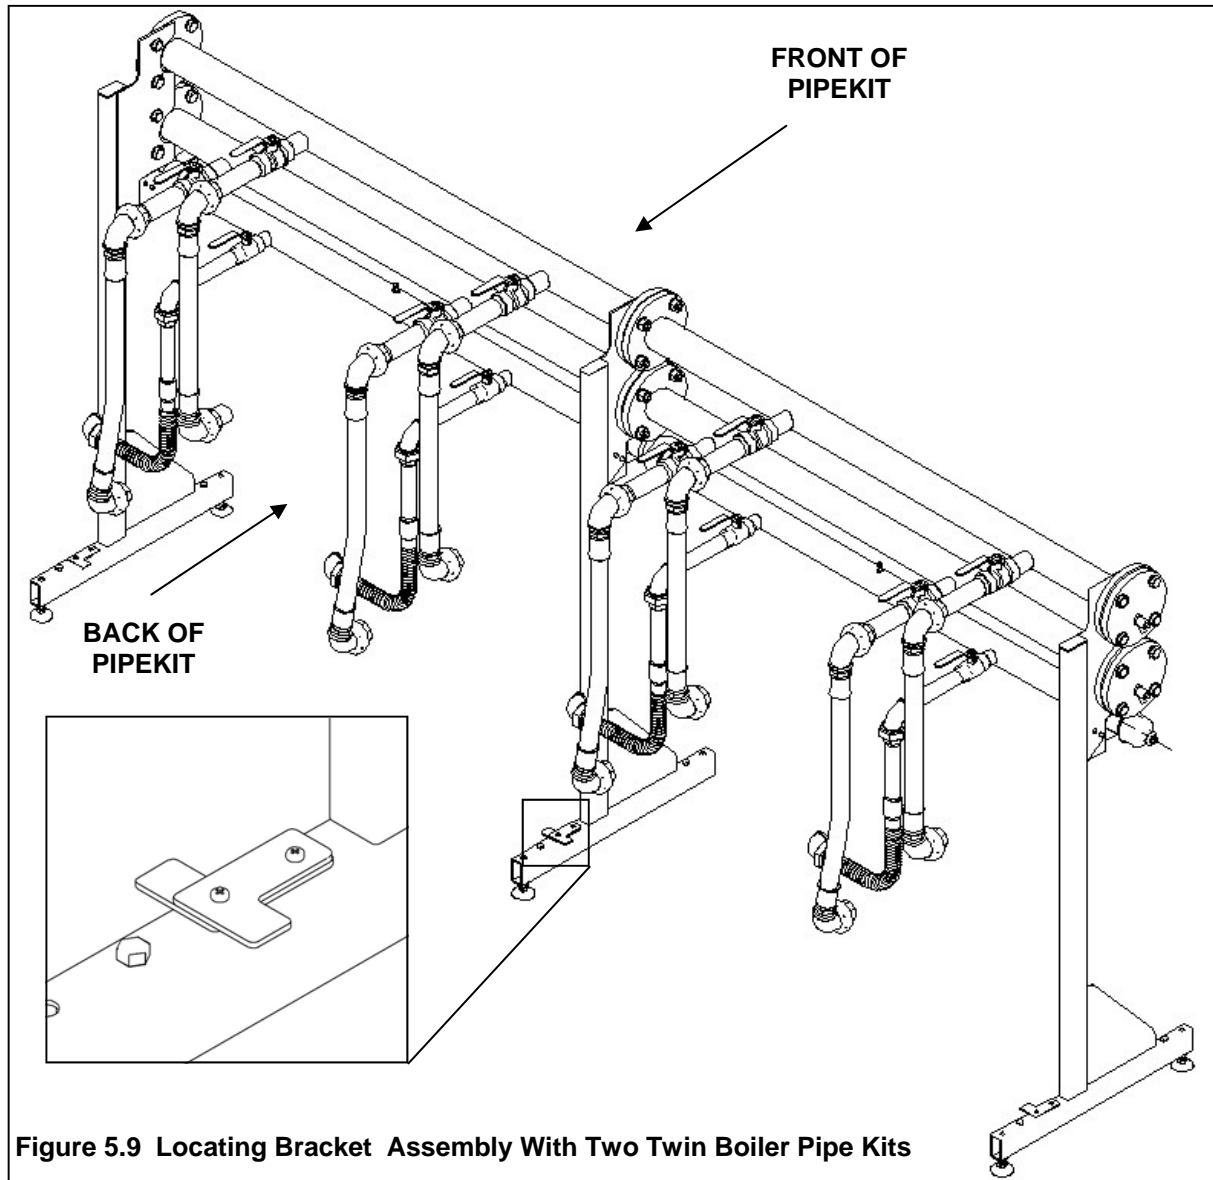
Locating Bracket Assembly With Two Twin Boiler Pipe Kits
